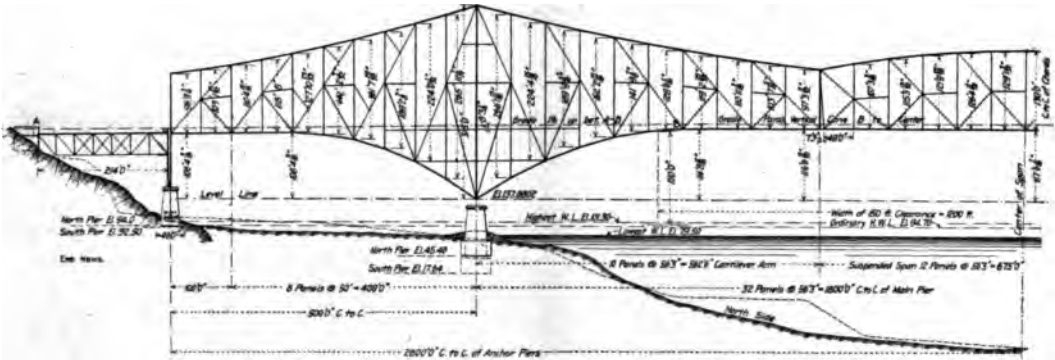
HALF DIAGRAM OF THE QUEBEC CANTILEVER BRIDGE.
